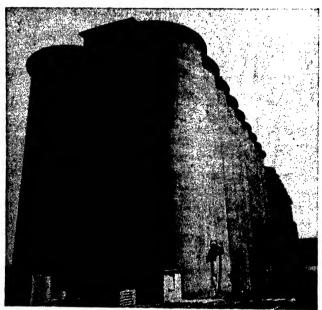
Concrete silos used for storage of cement at the factory. In the slack selling periods stocks of cement are built up to meet the heavier demands of
